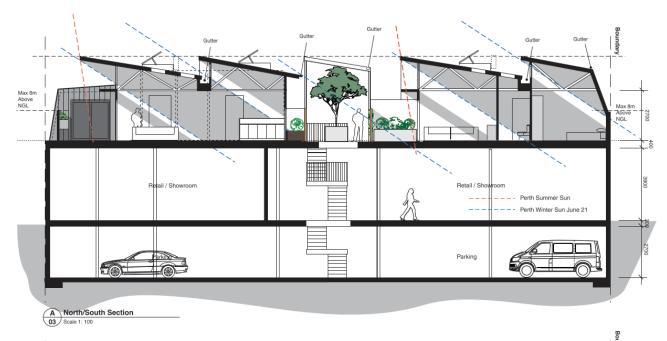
Amended Plan cross section demonstrating winter/summer solar access
